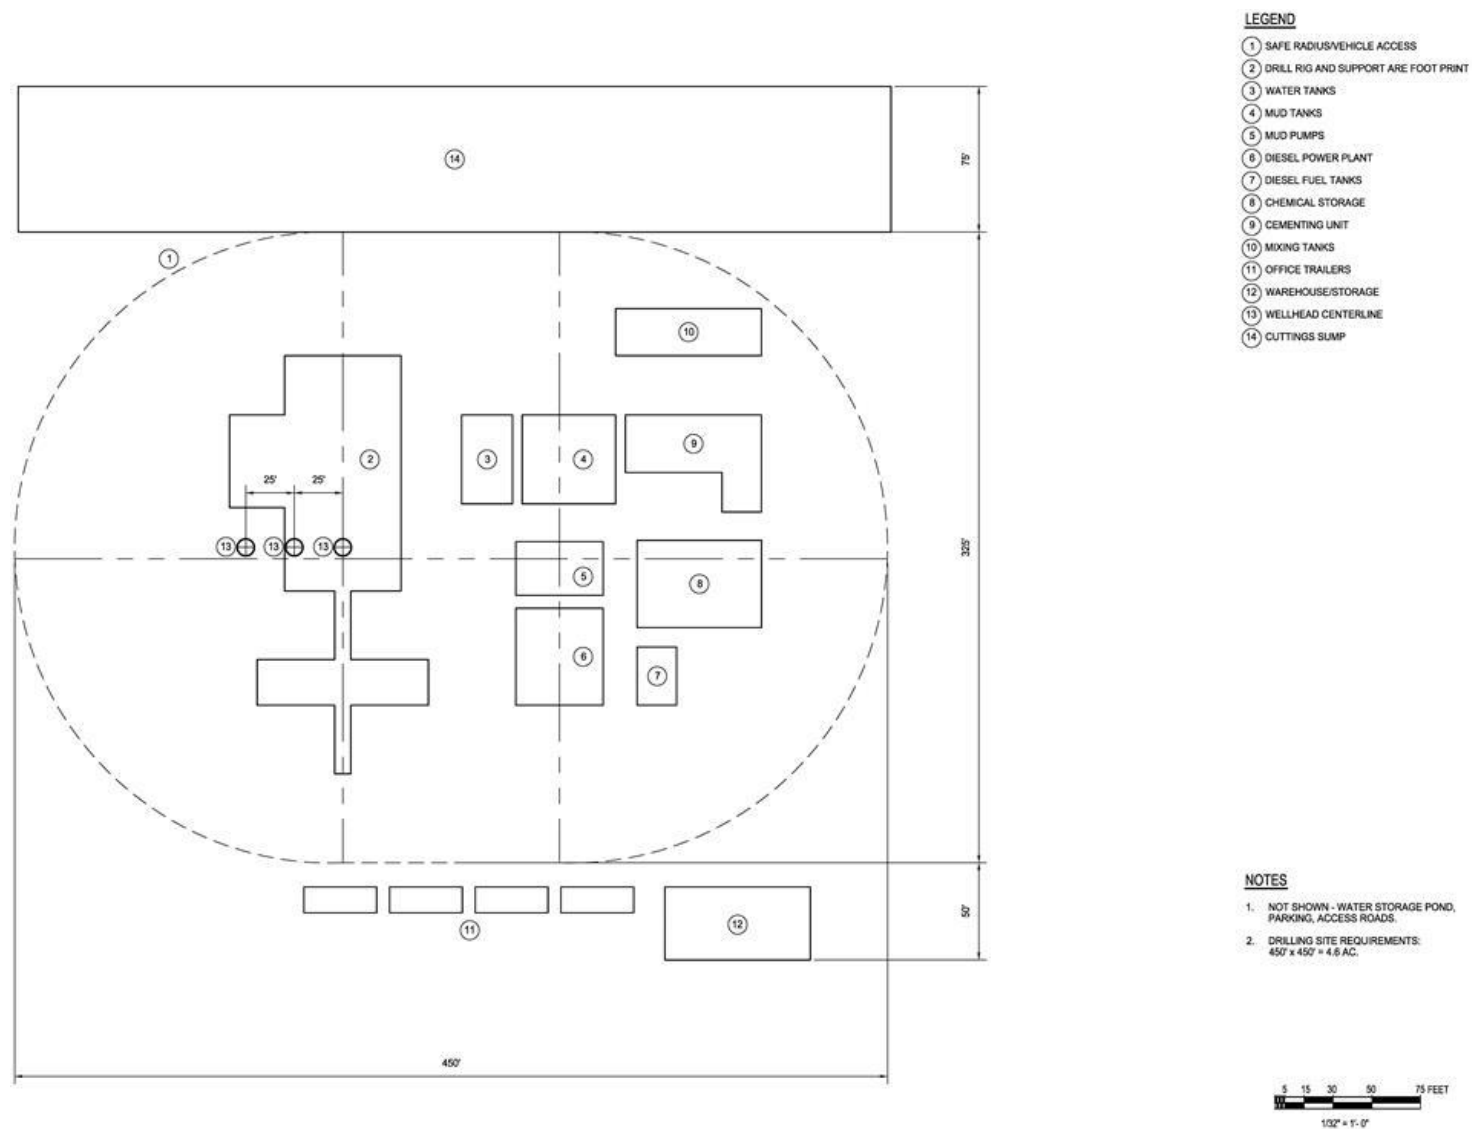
Site layout drawing of the proposed FORGE operations pad.
